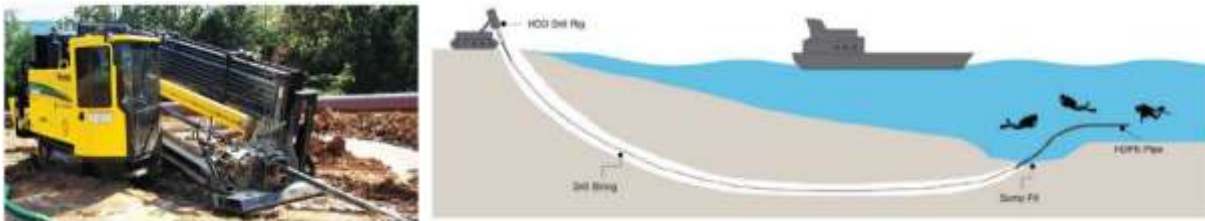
Drilling machine(left) and HDD profile (right).
